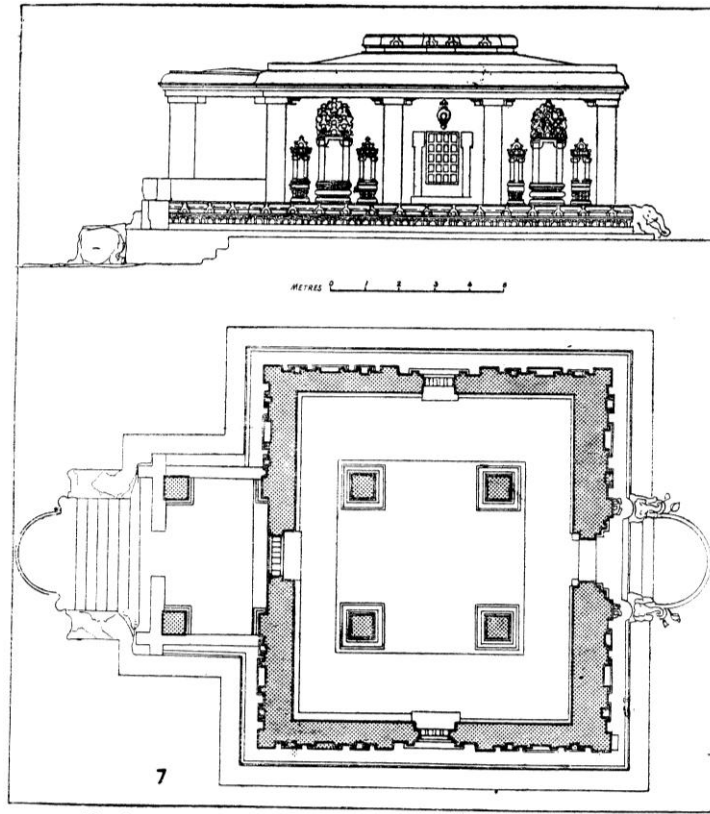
Plan and elevation of mandapa in front of Dasavatara Cave (XV).
